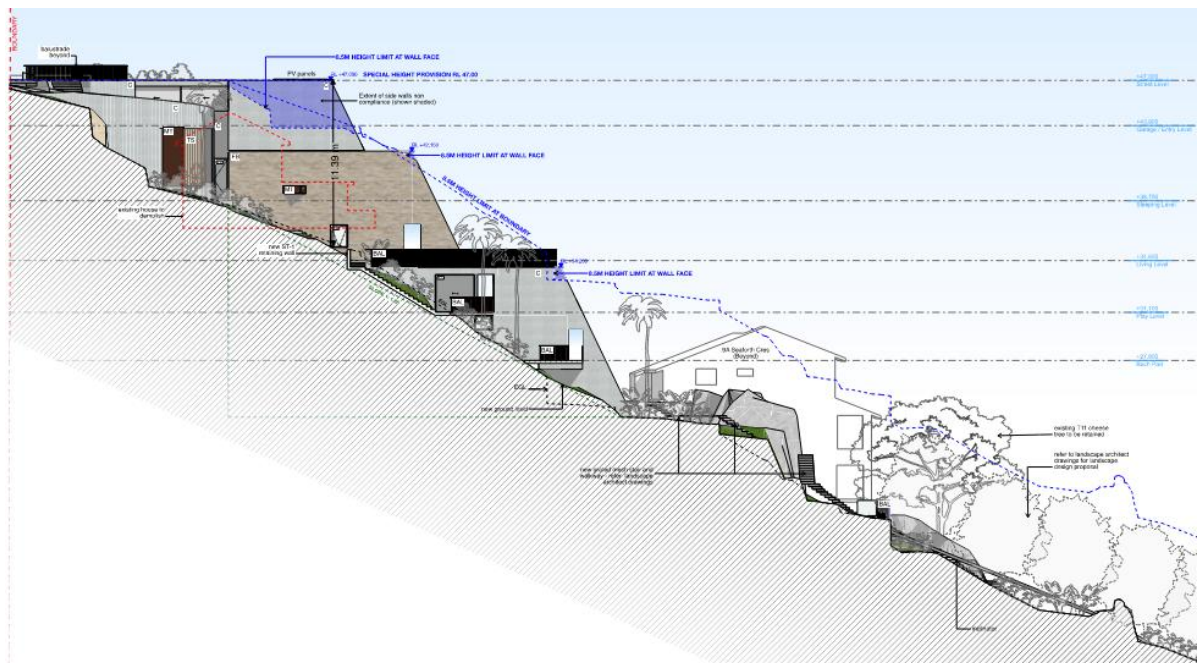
western elevation. The blue shaded areas denote the location and extent of proposed building height exceptions
